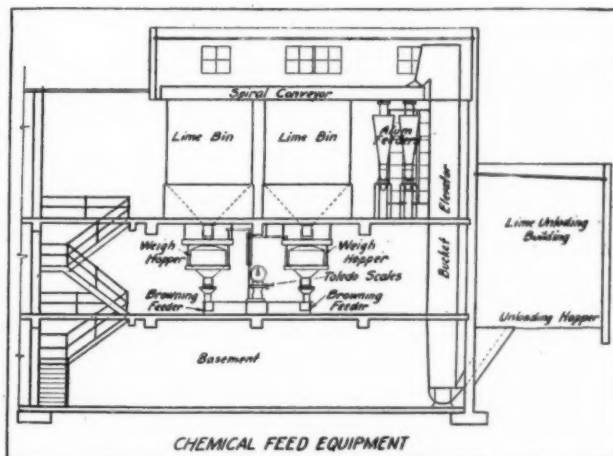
SECTIONAL VIEW OF CHEMICAL FEED EQUIPMENT
